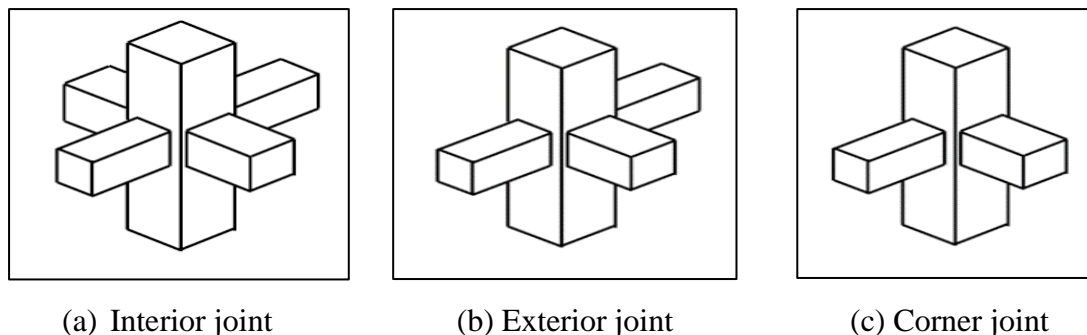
Types of joints in a frame: (a) Interior joint, (b) Exterior joint and (c) Corner joint
